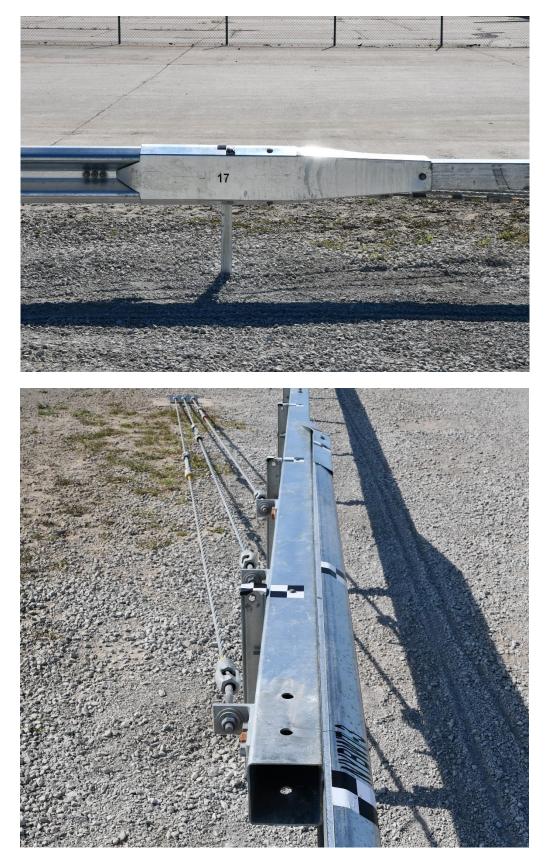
Transition Cover Assembly, Test No. NYBWT-3
